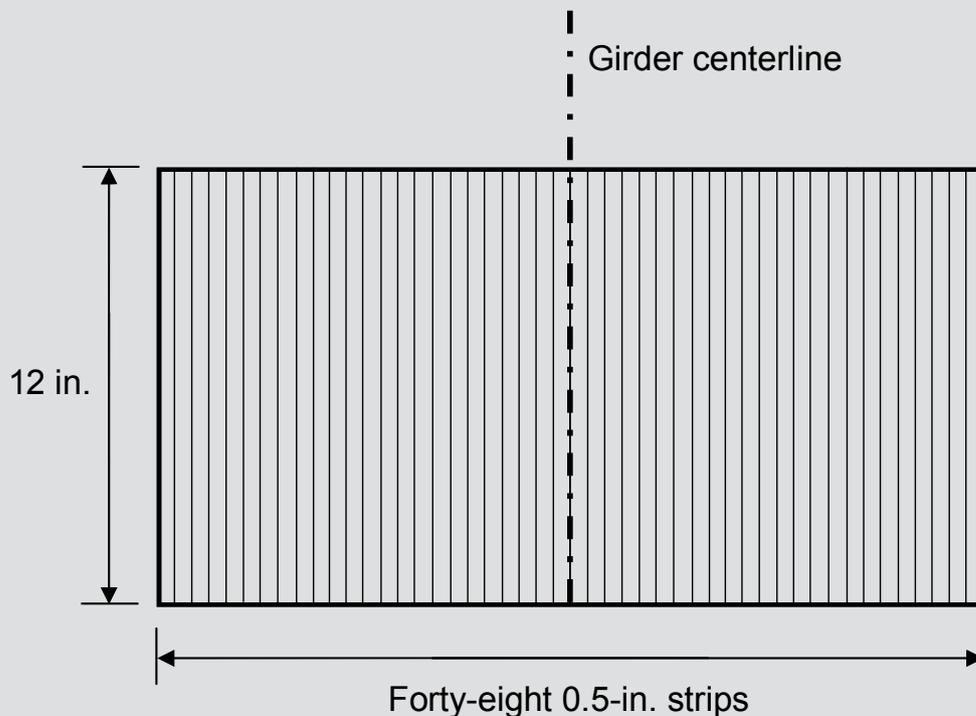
Plan drawing of the bearing pad strip model layout that was used to determine the vertical and rotational deformation of the bearing pad.
